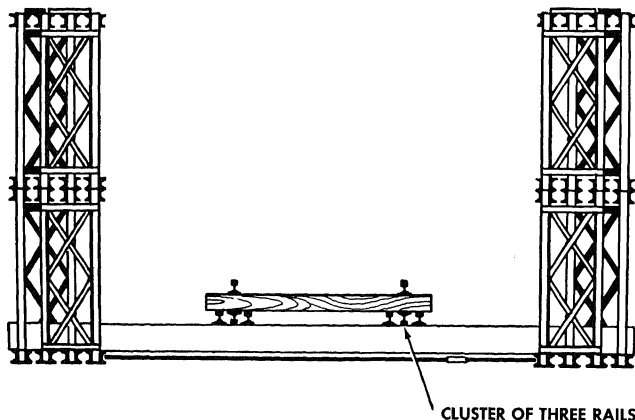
End view of 90-foot QD railway bridge built to carry the equivalent of Cooper's E-35 loading.
